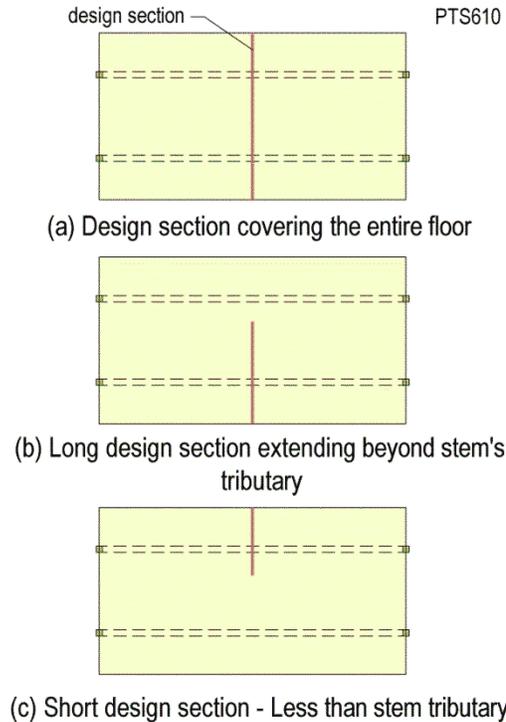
Design Sections of Different Widths
